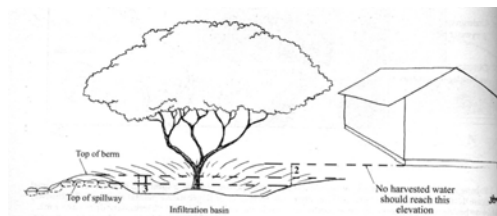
Three important elevations: Elevation 1: Overflow spillway is the low point of earthwork's perimeter. Elevation 2: Spillway is low enough to ensure nothing is accidentally flooded. Elevation 3: Basin is lower than elevation of spillway to ensure water is harvested, rather than drained.
